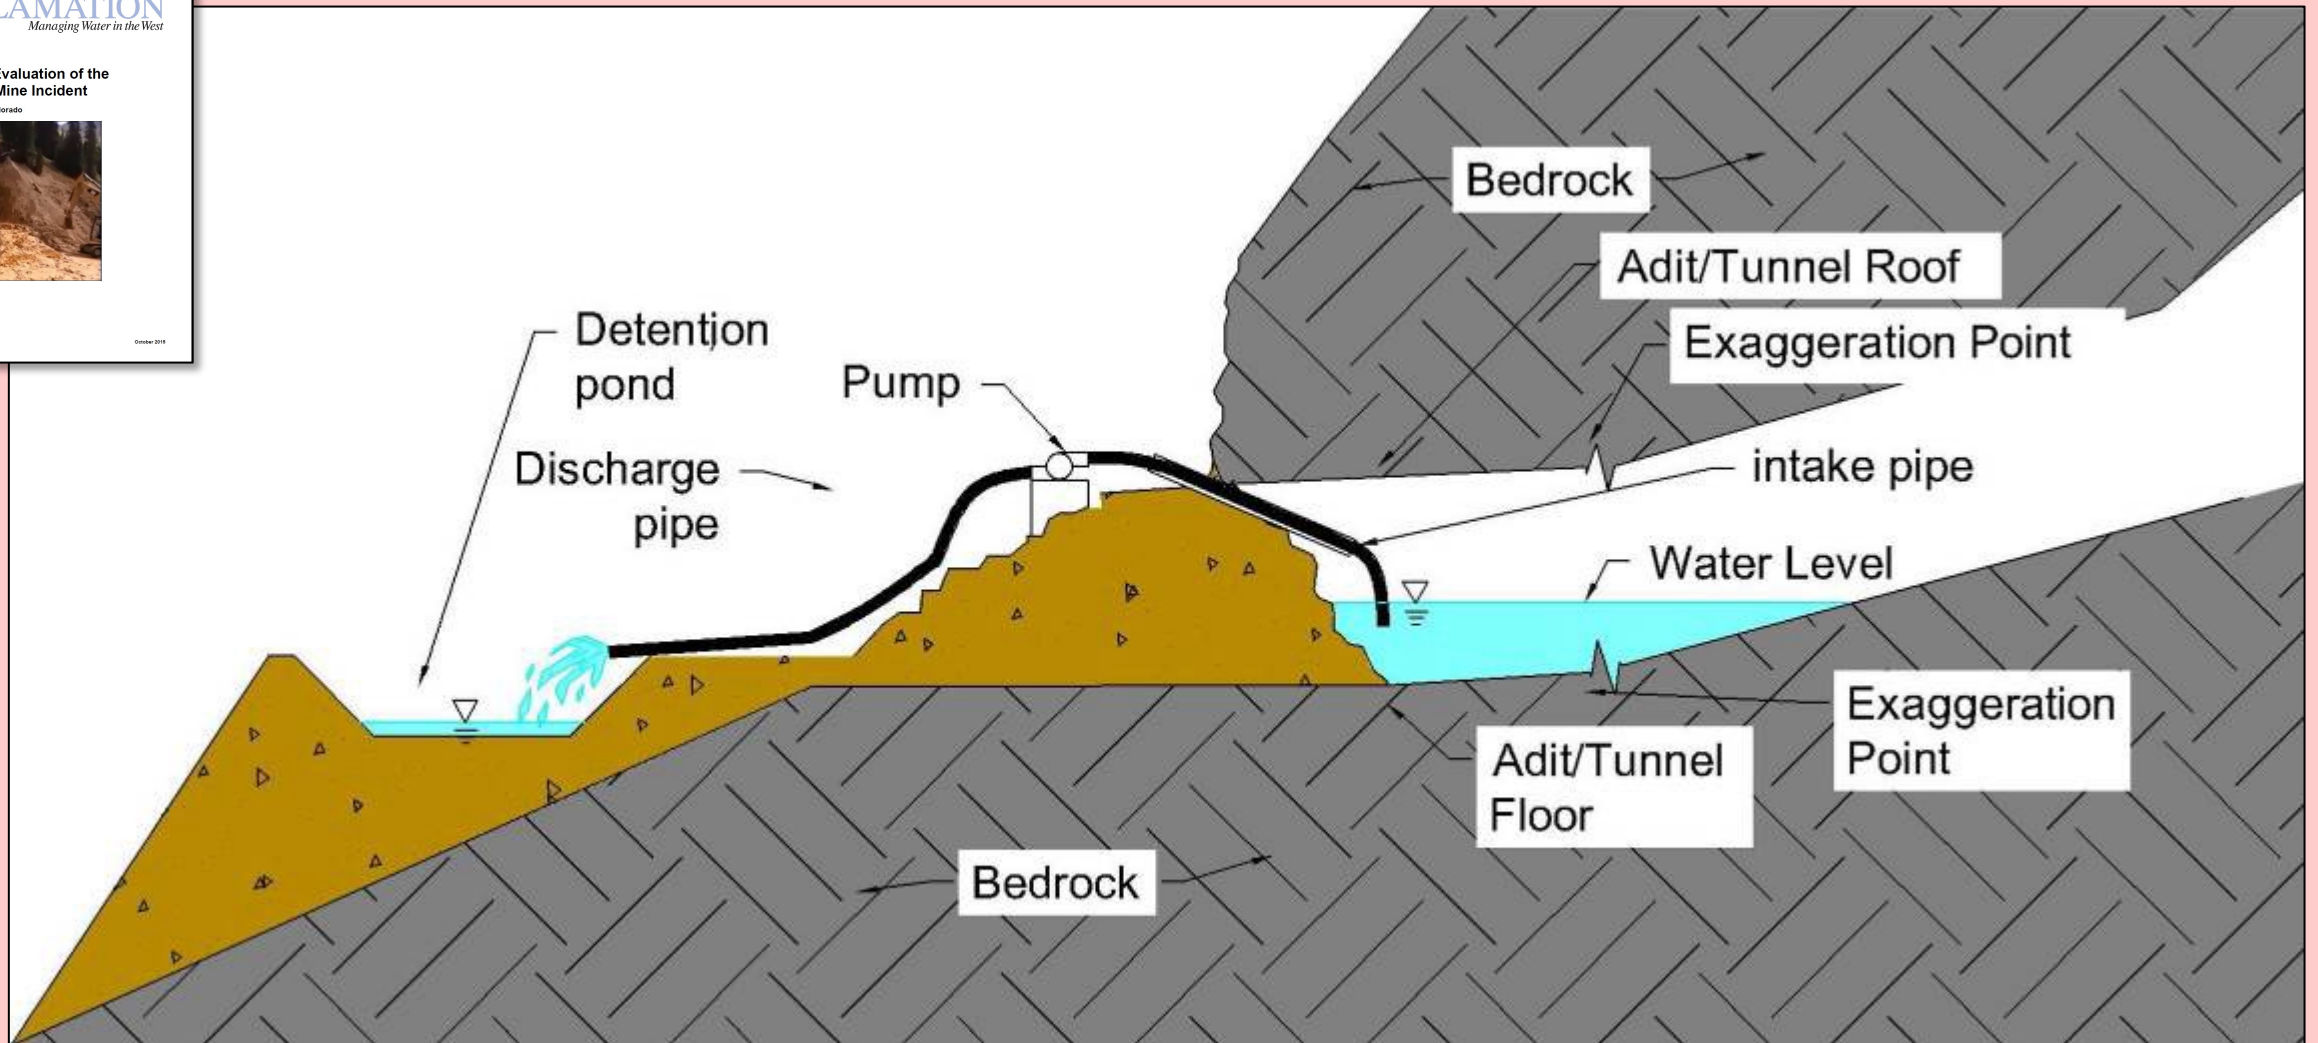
Cross-section illustration showing step 4 of the plan (not to scale). An intake hose from a pump is inserted into the steel pipe. The pump discharge is taken to a small pond constructed on the waste rock dump. Water from the adit is pumped down. Not shown on this illustration is that the water in the small pond would be continuously removed by another pump and sent to treatment elsewhere on the site.
